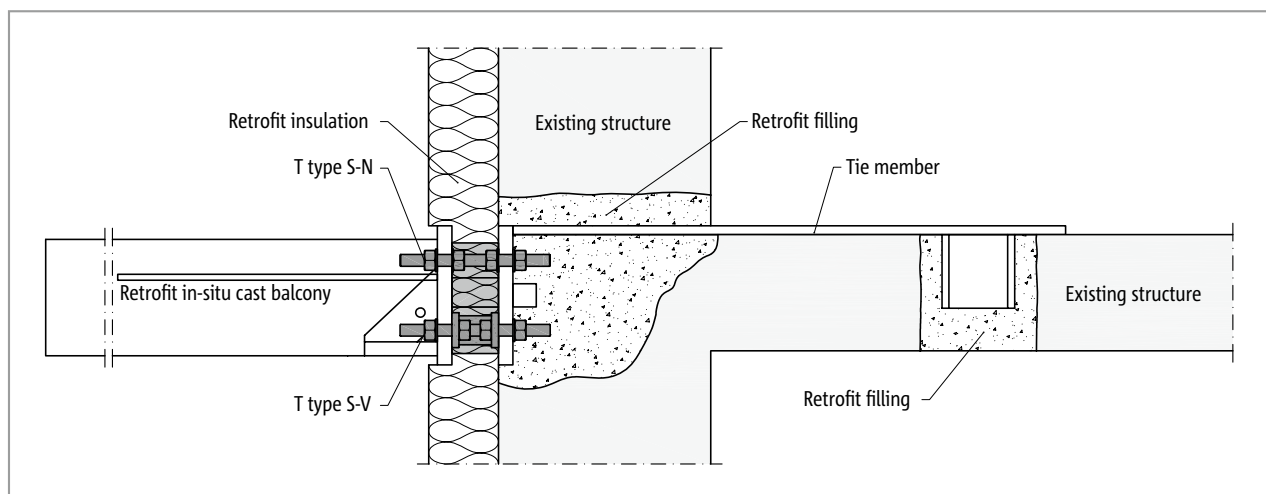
Schöck Isokorb® T type S-N and T type S-V: Retrofitted cantilevered in situ concrete balcony, with support connected to existing reinforced concrete slab
